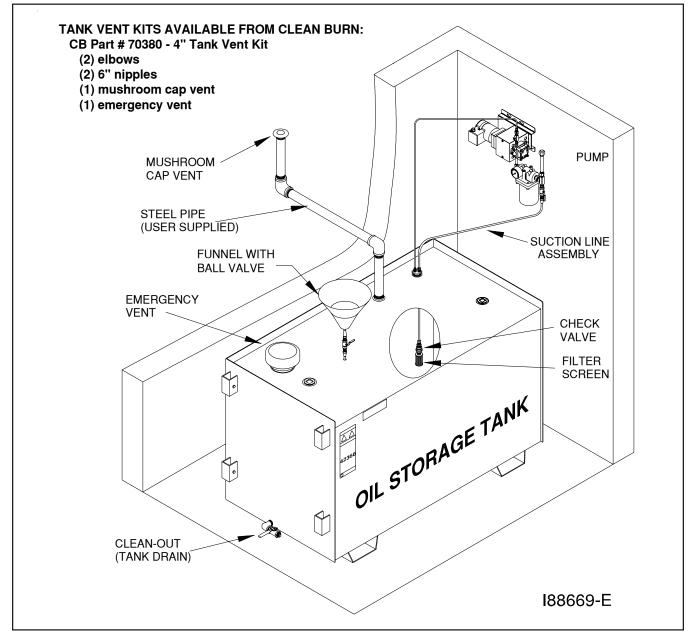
F - Typical Metering Pump Installation with Inside Tank
